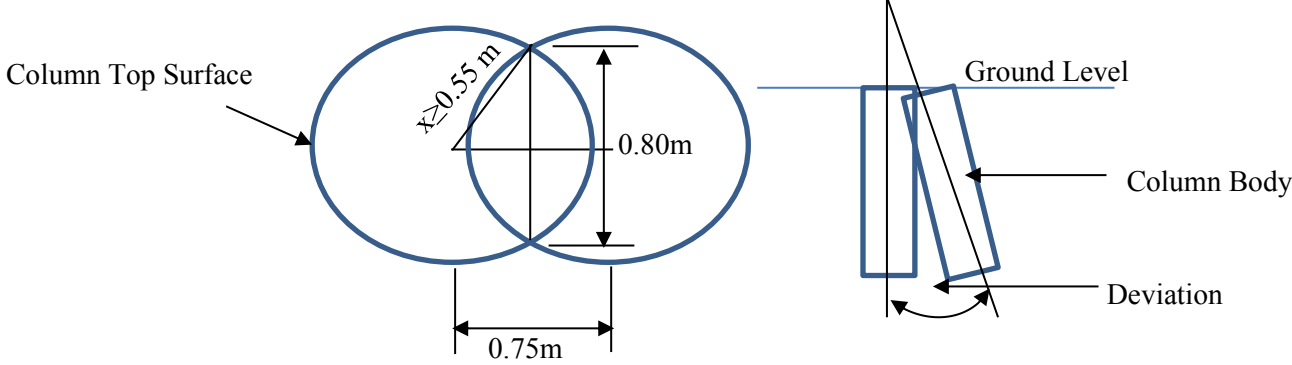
Plan and vertical sectional view of two adjacent columns; assuming perfect symmetry.
